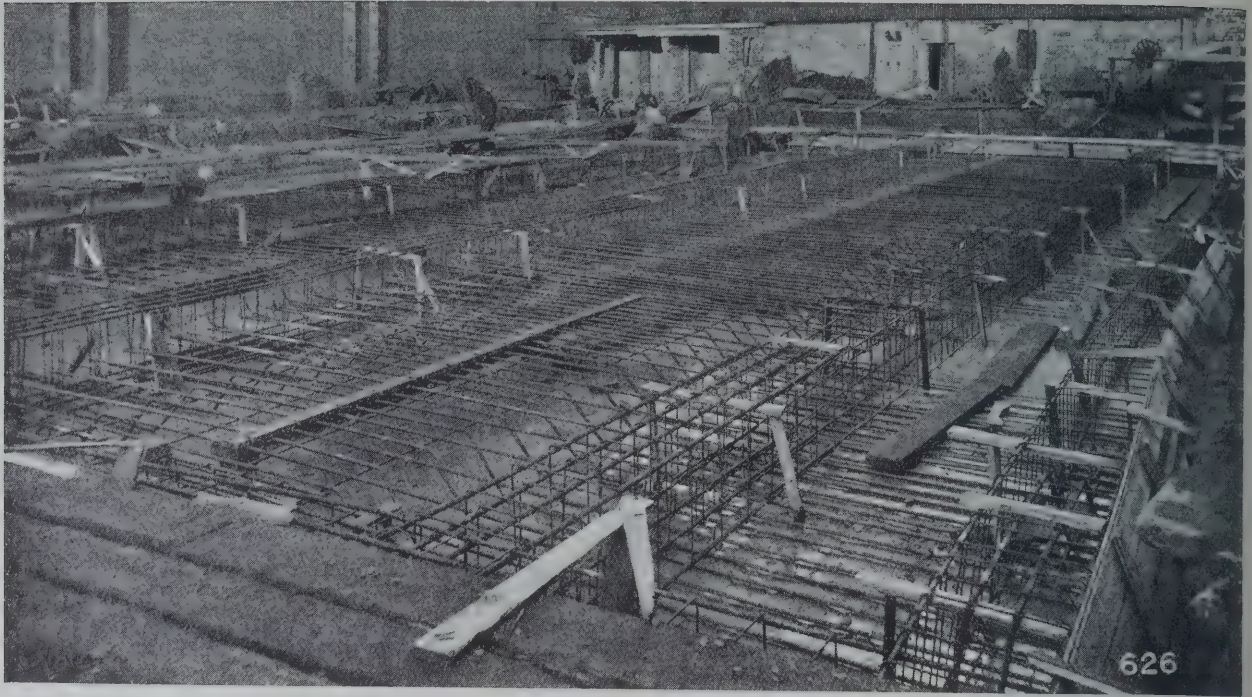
REINFORCED CONCRETE RAFT AT GREENOCK.
